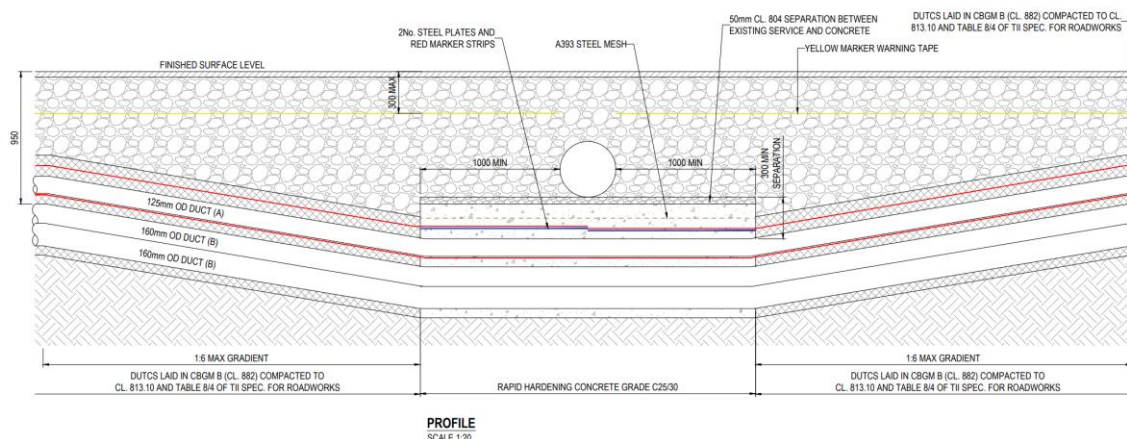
Typical undercrossing detail (CSEA sheet: 1545)
